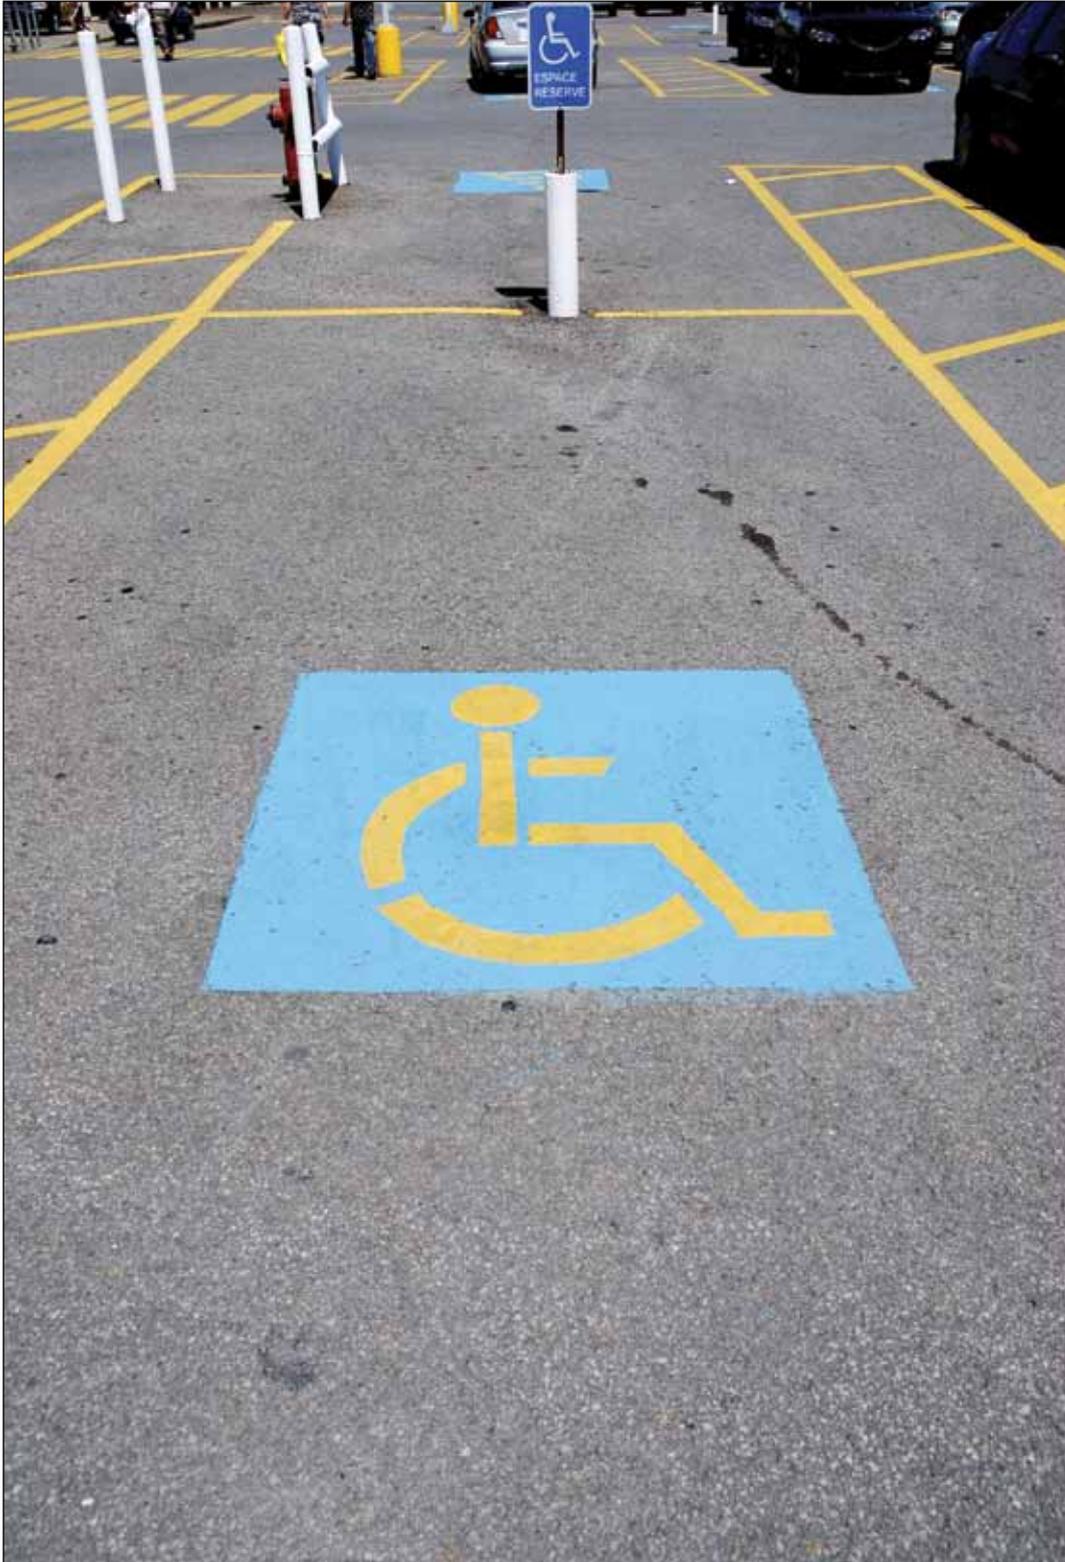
Example of insufficient accessible parking spaces. Please note the lack of a post-mounted sign with the international symbol of access fixed to it and the lack of dropped kerbs.
